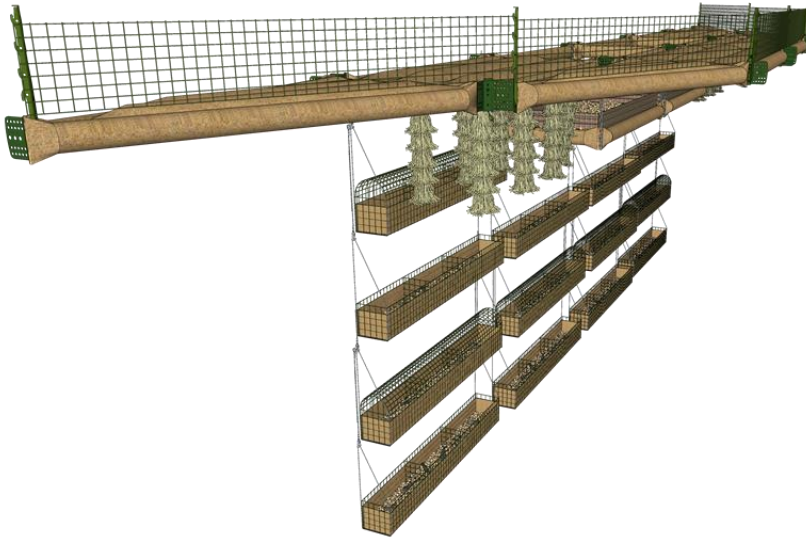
Visualisation of hanging fish wall showing enclosed wooden planters
